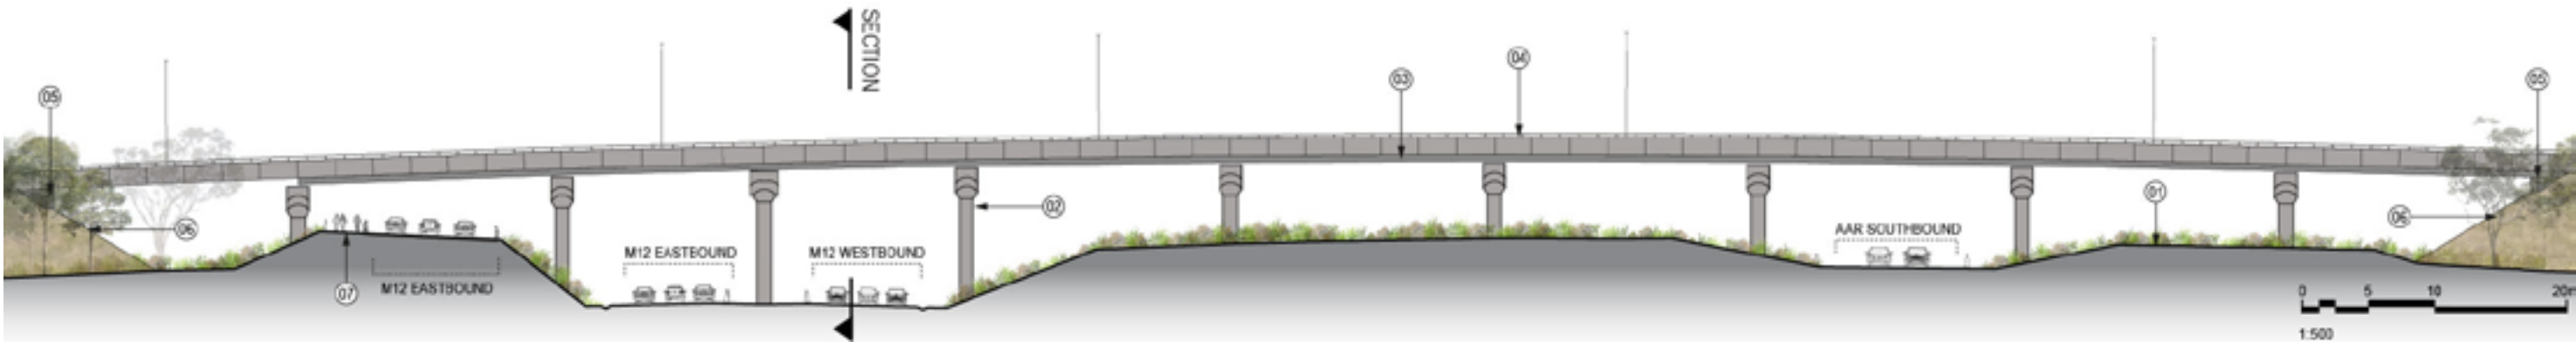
Elevation - BR21 - M12 Eastbound to Airport Access Road Southbound
